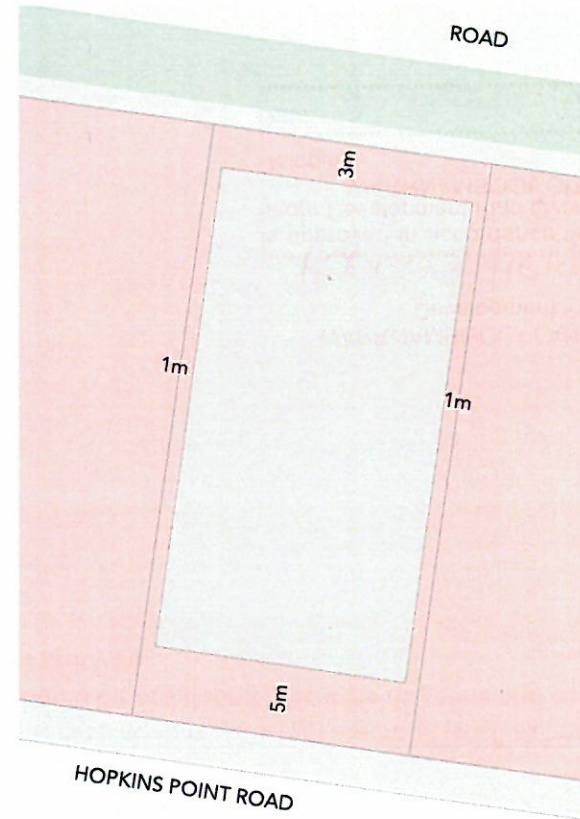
Conventional Residential Lots Building Envelope (Hopkins Point Road)
